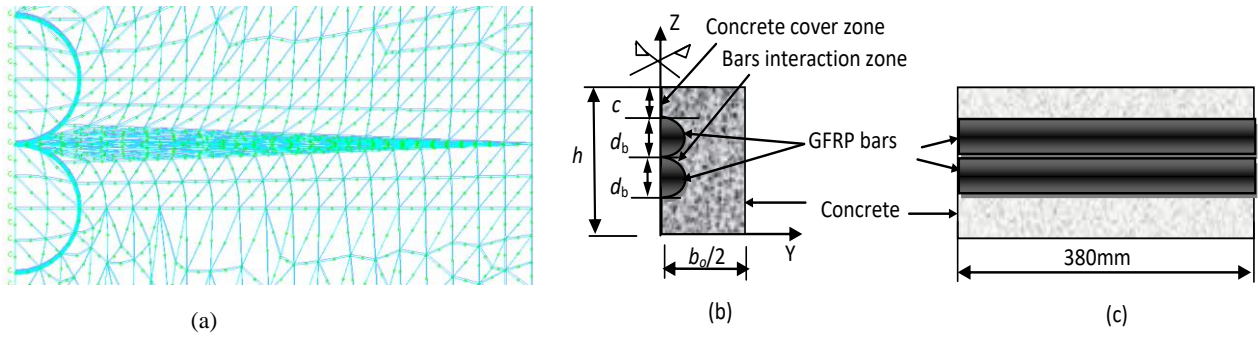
Detail of reinforced concrete beam: (a) Meshing of the both GFRP bars and concrete through the width $b_o/2$, (b) The half of the modelled cross-section of beam, (c) Concrete beam reinforced with two overlapped GFRP bars
